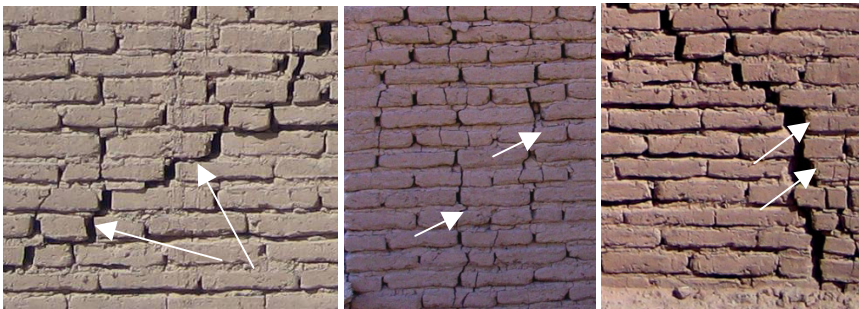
Friction (left), tension (middle) and beginning of shear-compression failure (right, crashing) of the adobe-masonry.
